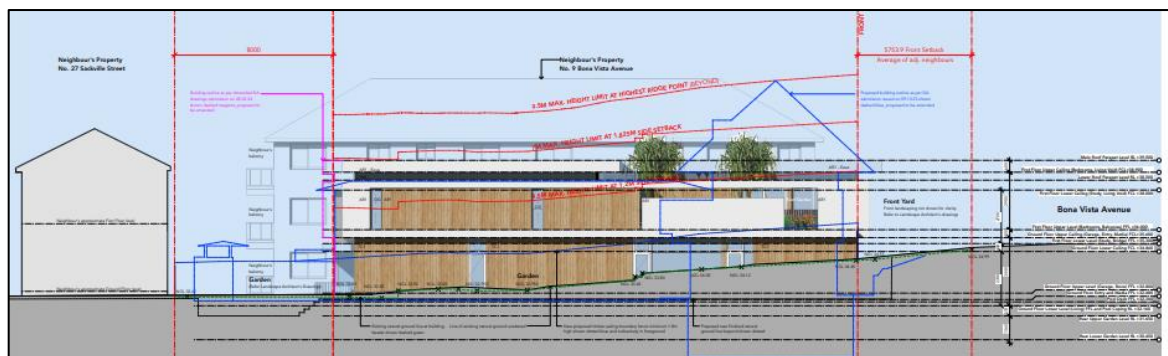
Northern Elevation of subject Development – 3-7 Bona Vista Avenue (Source: Dominic Levene)
